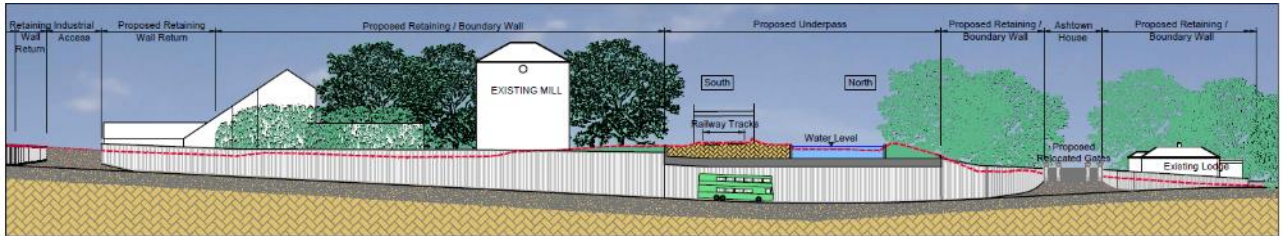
Ashtown Emerging Preferred Option Sectional Elevation Looking West
